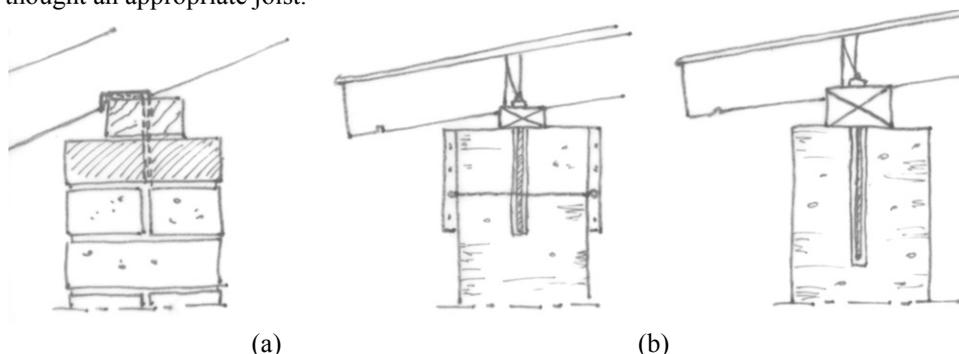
Solutions for roof-wall connections: (a) wooden ring beam positioned at the centre of the top of the wall, on a terracotta plate; (b) reinforced band beam for existing construction; (c) heavy wooden beam with frequent anchorage extending down into the wall
